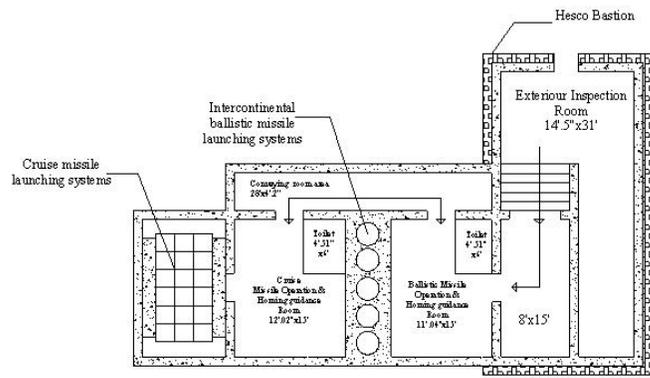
Section plan in Army Trench Base of Concrete Bunker (included features)
